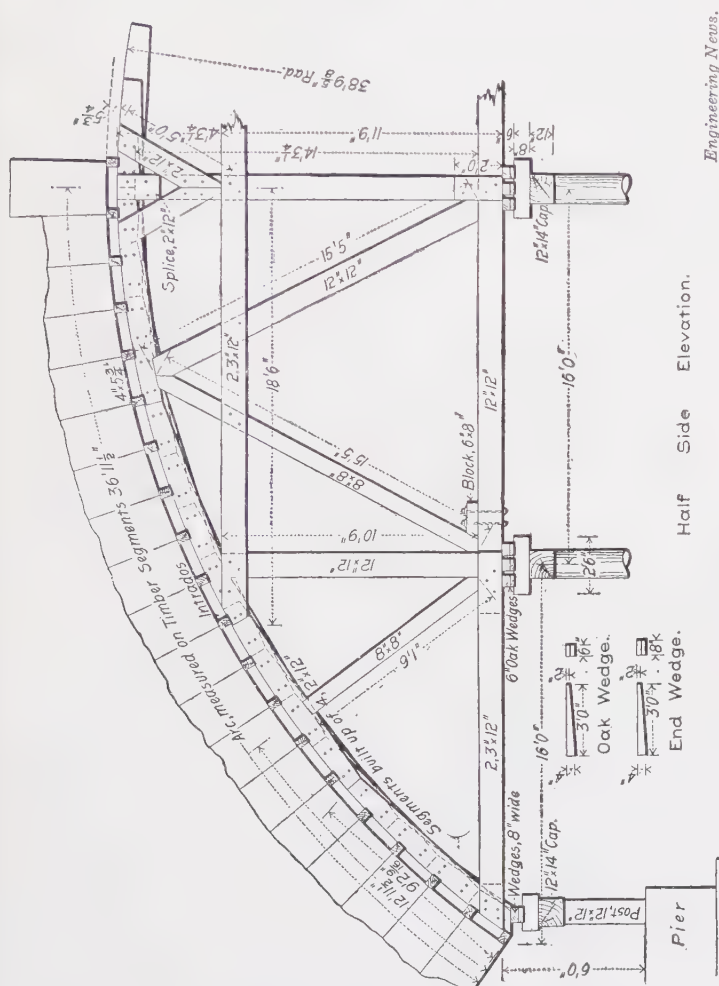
Centering for Stone Arch Bridge of the Chicago, Milwaukee and St. Paul Railway over Rock River at Watertown, Wis. (See Fig. 80i.)
